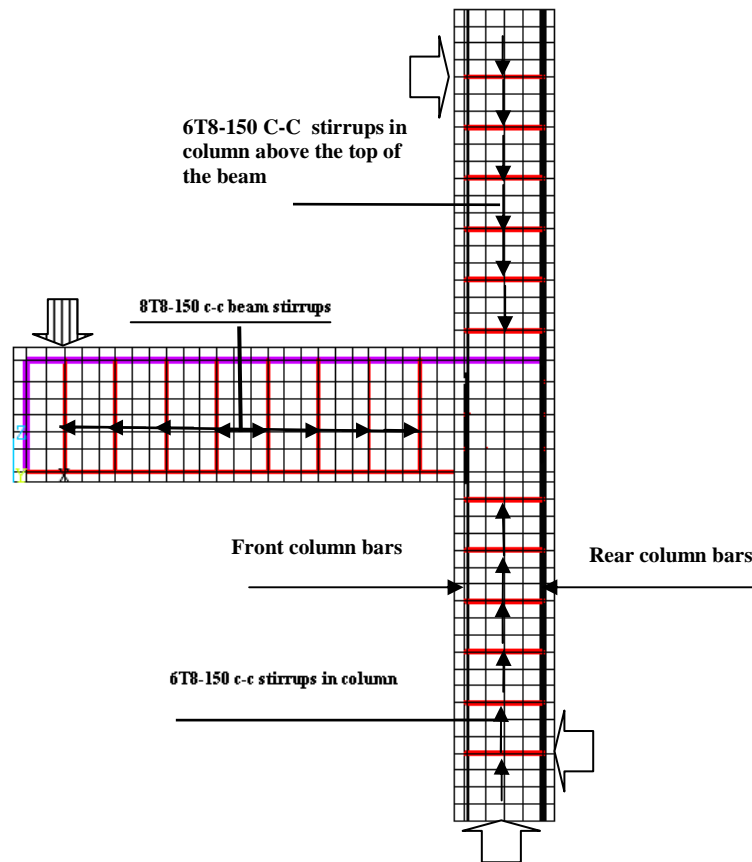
Elevation of the BCJ-A showing stirrups in beam and column. For sections refer to Figure 7-50 for beam and Figure 7-48 for column
